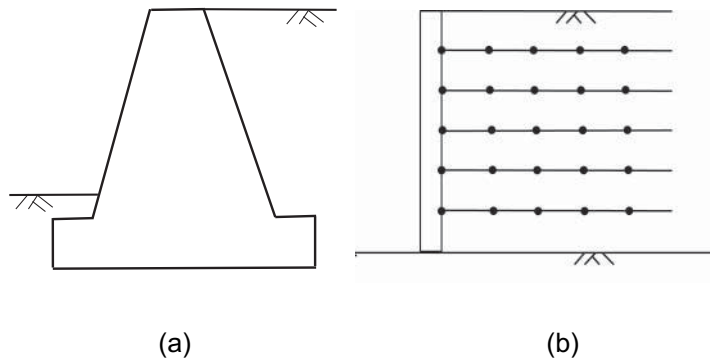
(a) Traditional gravity retaining wall. (b) Mechanically stabilized earth wall [1]
